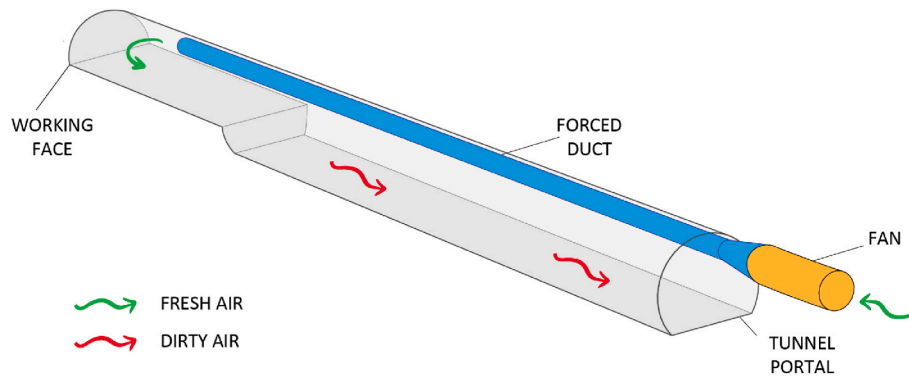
Typical forced ventilation scheme in a tunnel. Axial fan located at the tunnel portal and flexible ventilation duct from the tunnel portal to the working area.
